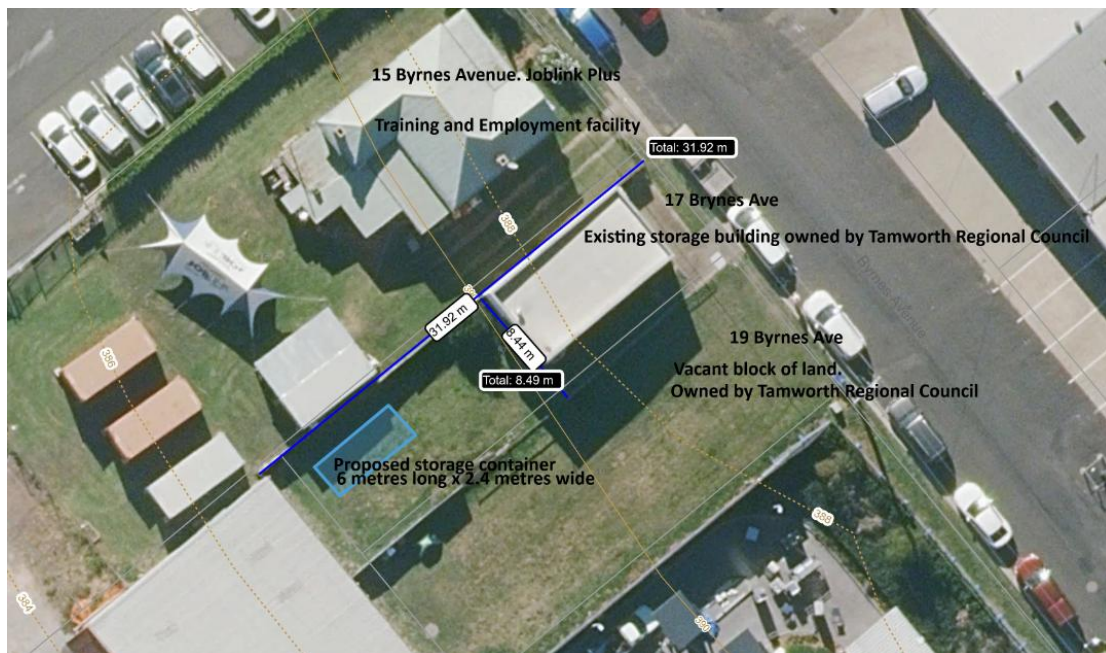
17 Byrnes Avenue, Tamworth – proposed location for shipping container
